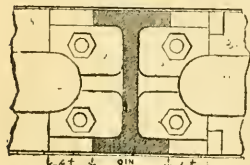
Transverse section of a bar, and elevation of heel-post.
